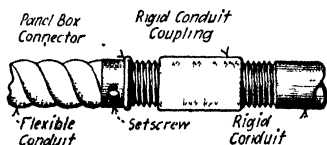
Joining flexible conduit to rigid conduit by using a panel-box connector and a rigid-conduit coupling.
